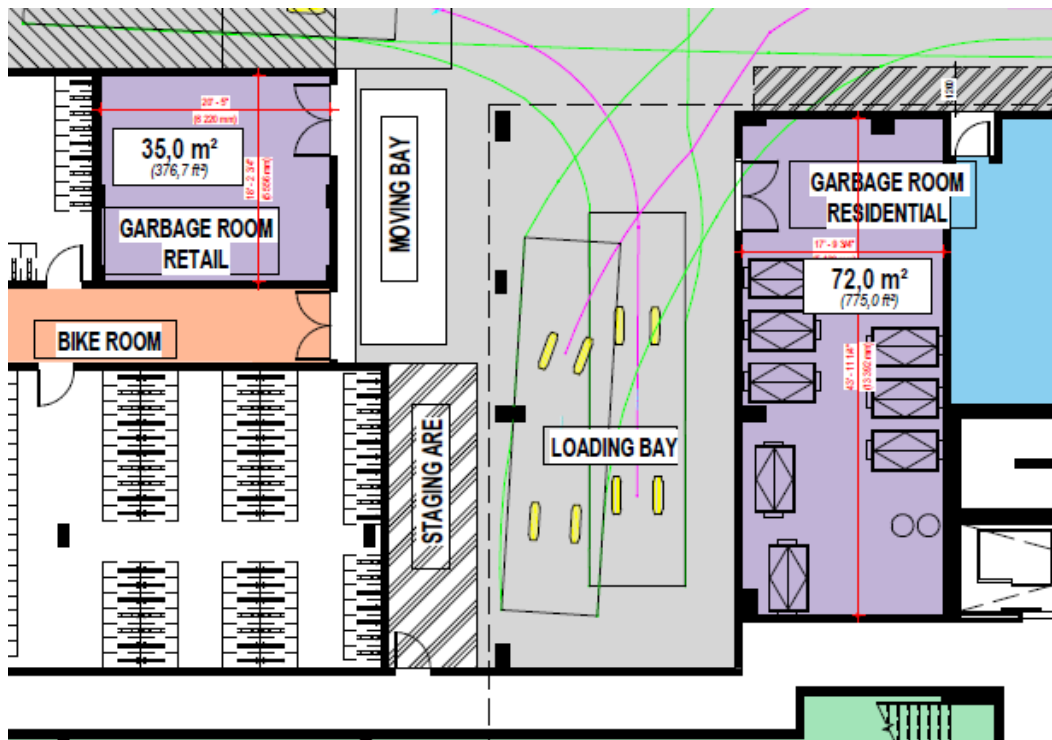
Garbage Rooms – Retail + Residential – South Tower + loading bay and staging area
